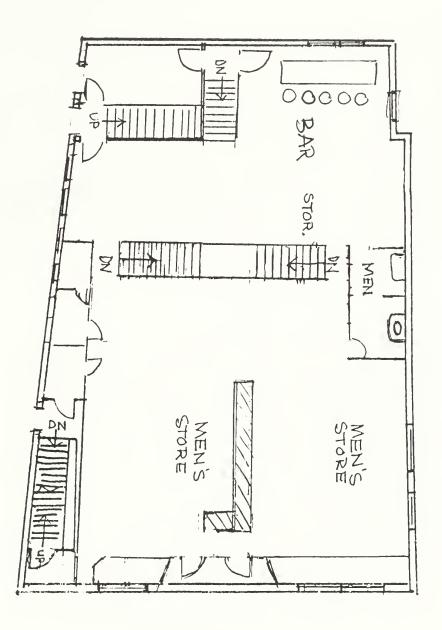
Polish Club building: conjectural first-floor plan, 1909-47.
